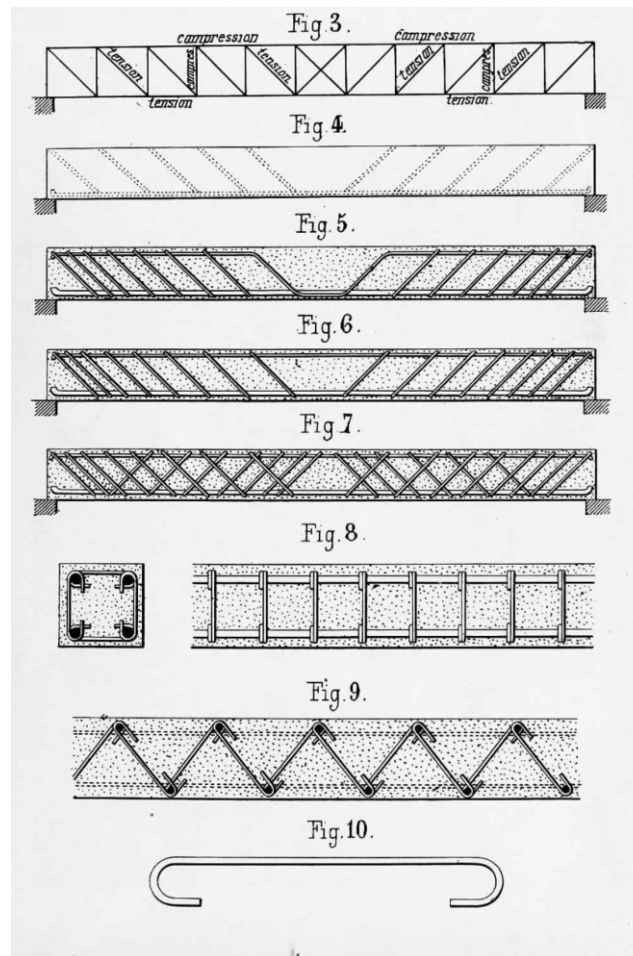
Coularou reinforced concrete system beam sections showing the 45 degree internal flanges. (Coularou, n.d., p.6)
